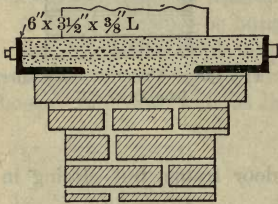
Corbeled Concrete and Angle-iron Door Sill.
